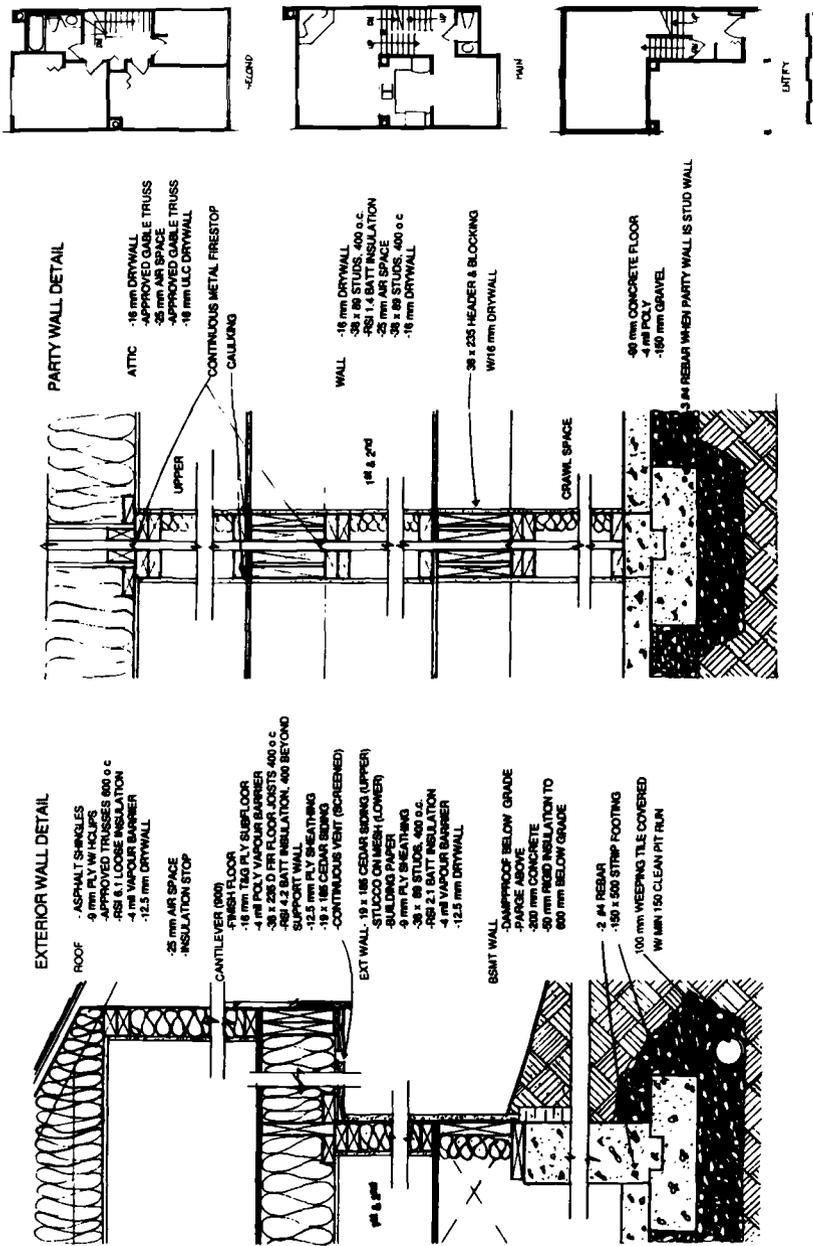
Exterior wall section, party wall section, and floor plans for Project 8.
